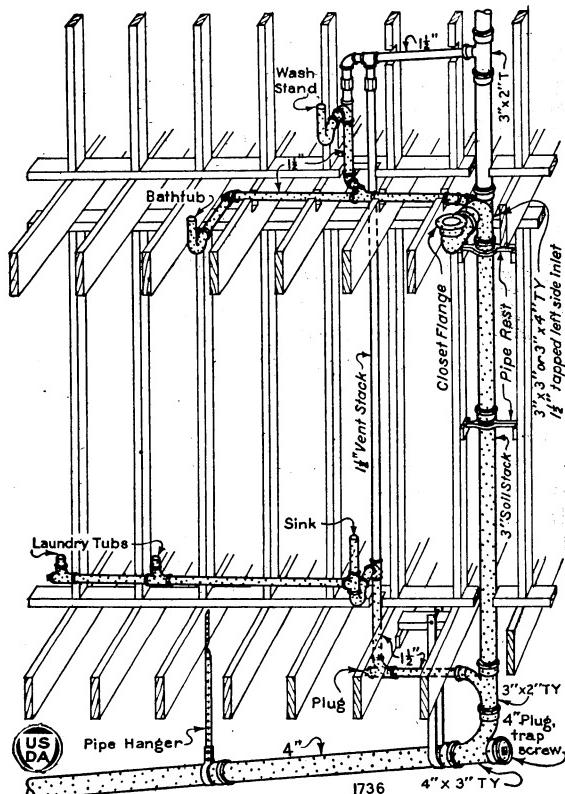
Supporting and roughing-in a simple two-pipe system having continuous wastes and vents; the most effective way of venting traps. Drainage pipes are stippled and vent pipes are outlined
